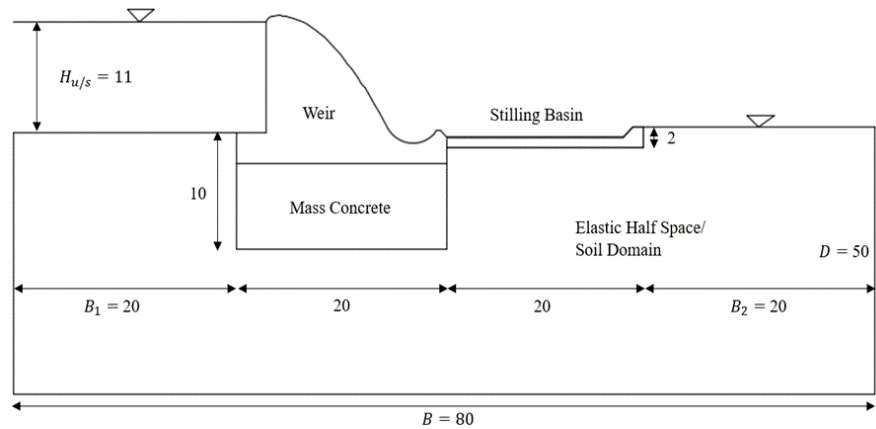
Geometry and Dimensions (m) of the Weir structure foundation [13].
